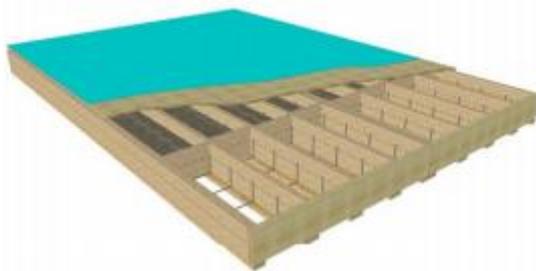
Trä8 floor element layout (Abrahamsen, 2017, p. 8)
